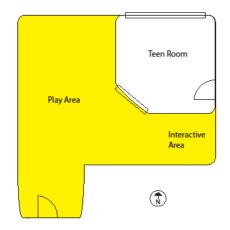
Presbyterian Hemby Play Room Plan. Not to scale.
